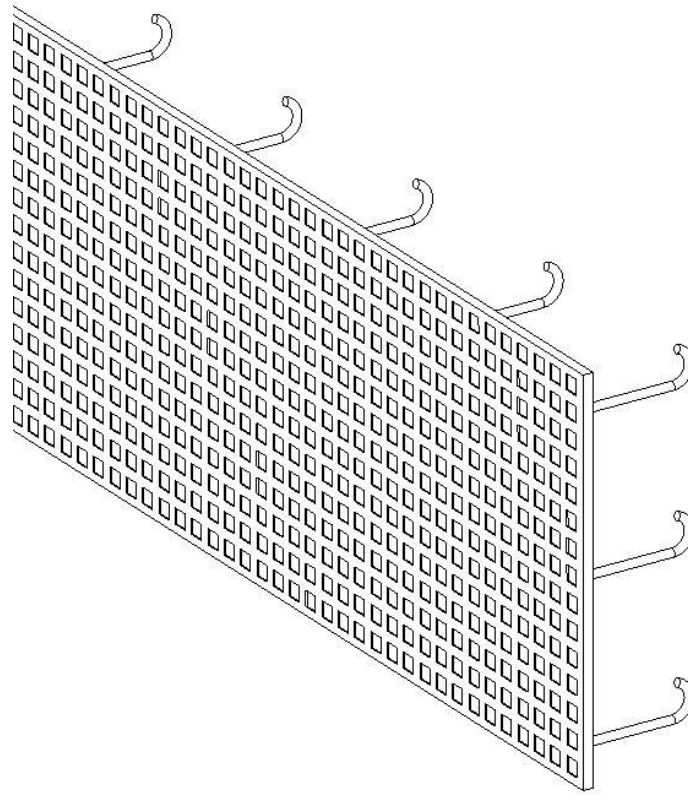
Plastic EB Joint Bearing Plate with Nail Anchors
